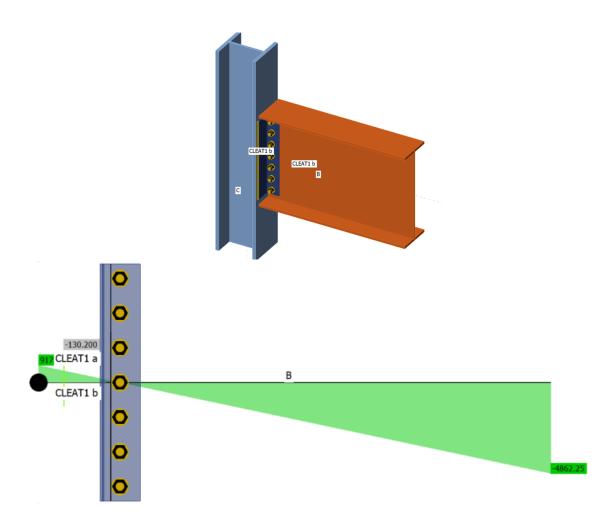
IDEA StatiCa model setup (top) and the wireframe model in bottom for the double angle connection specimen, Test No 4 (force applied on the centroid of the bolts group)
